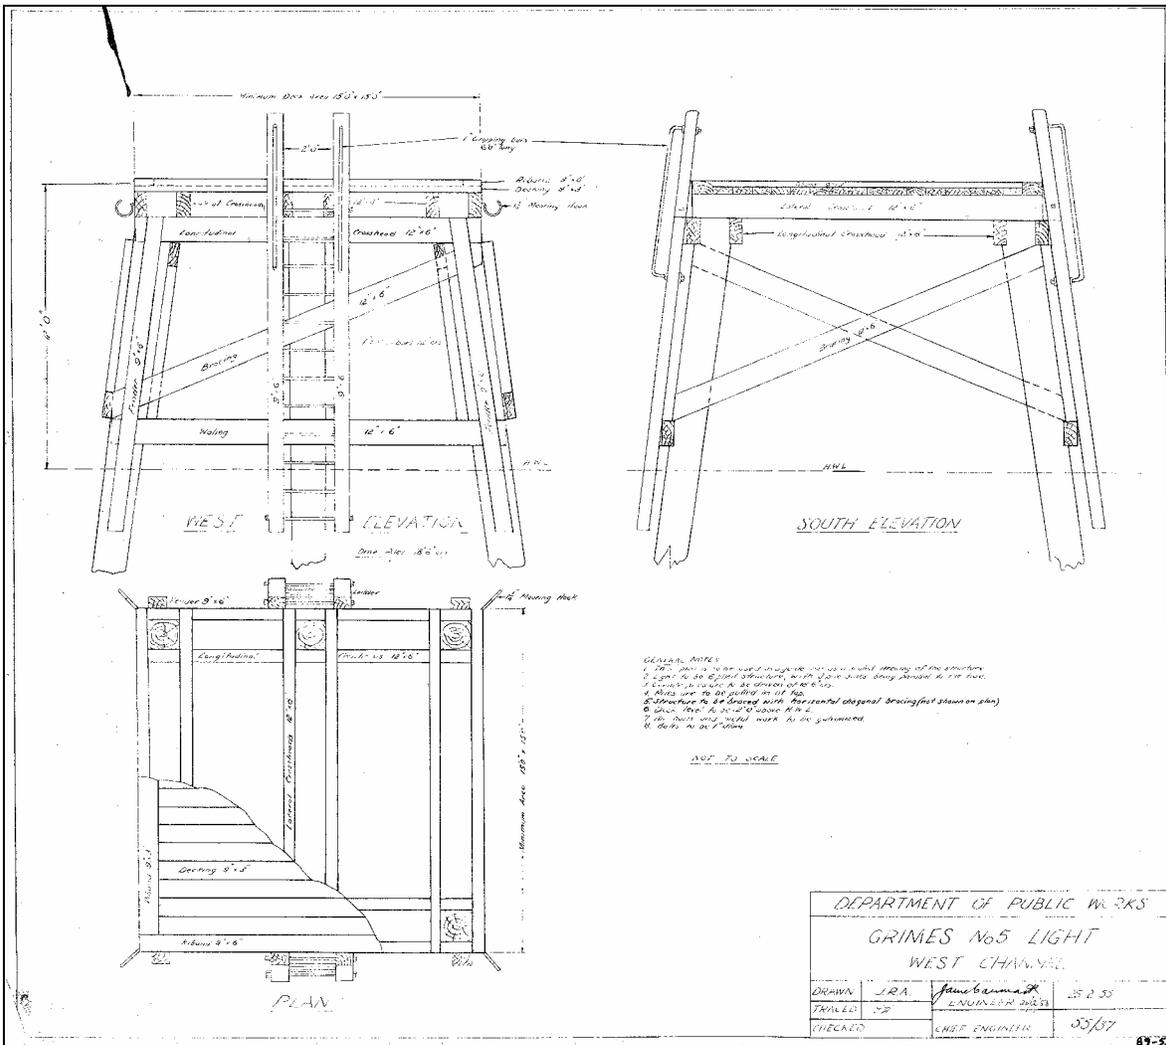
38: Plan of Grimes #5 West Channel Light (DPW 55/37:1955 plan, QMM Collection).
